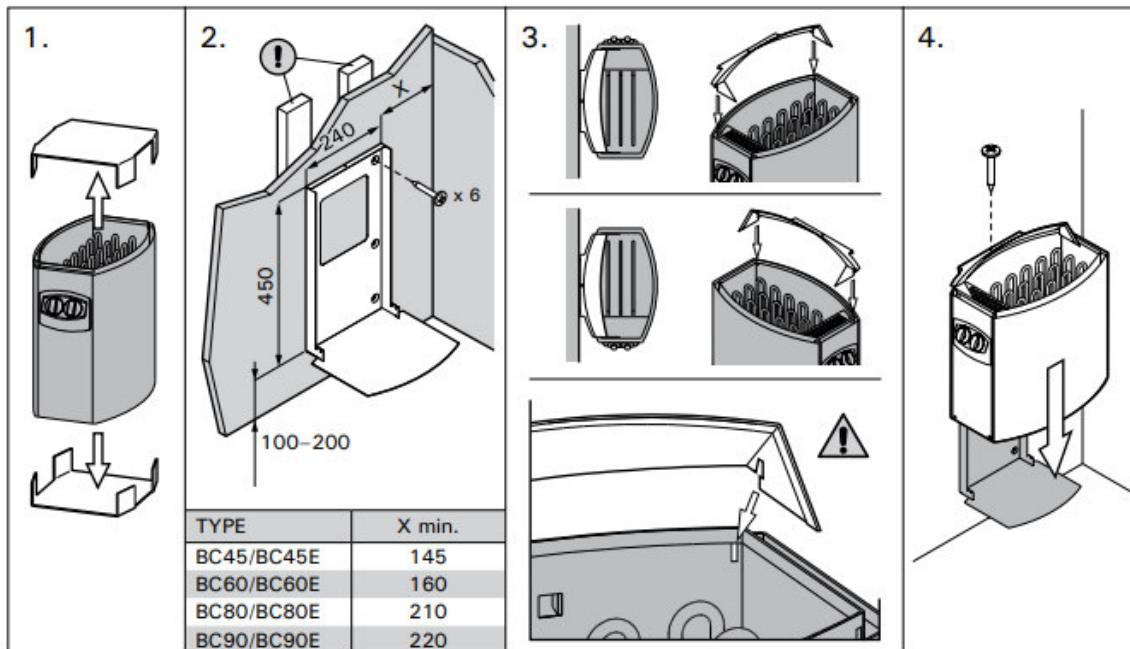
Fastening the heater on a wall (all dimensions in millimeters)
